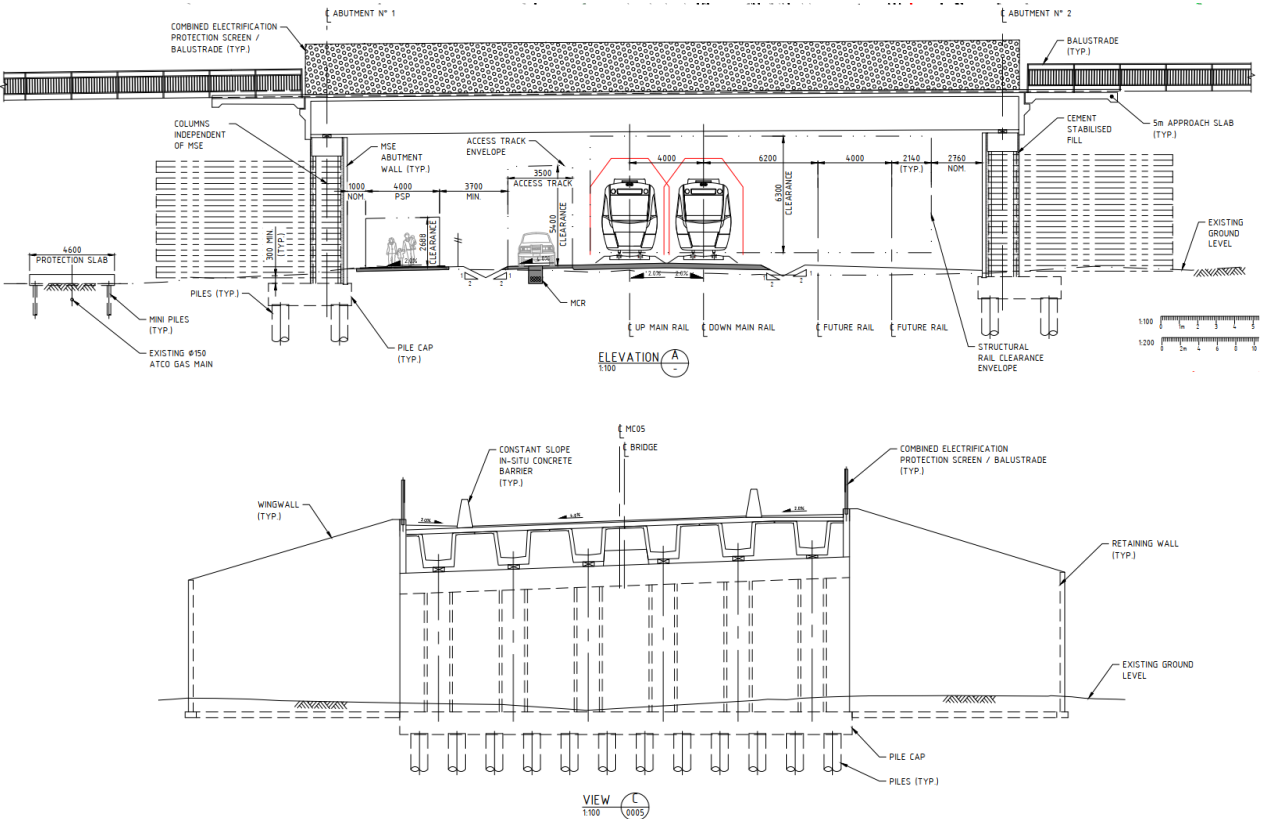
Proposed Pile Arrangement for Eleventh Road Bridge
